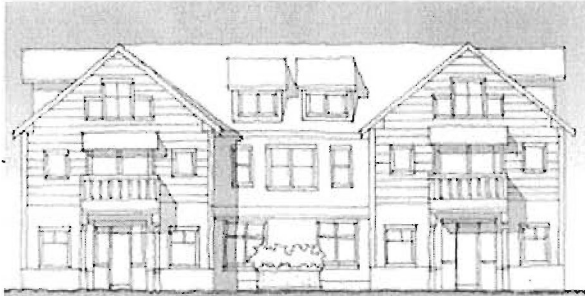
c.1 (1) residential building elements such as balconies, dormers and exterior staircases can be used to break up the massing of larger residential buildings
